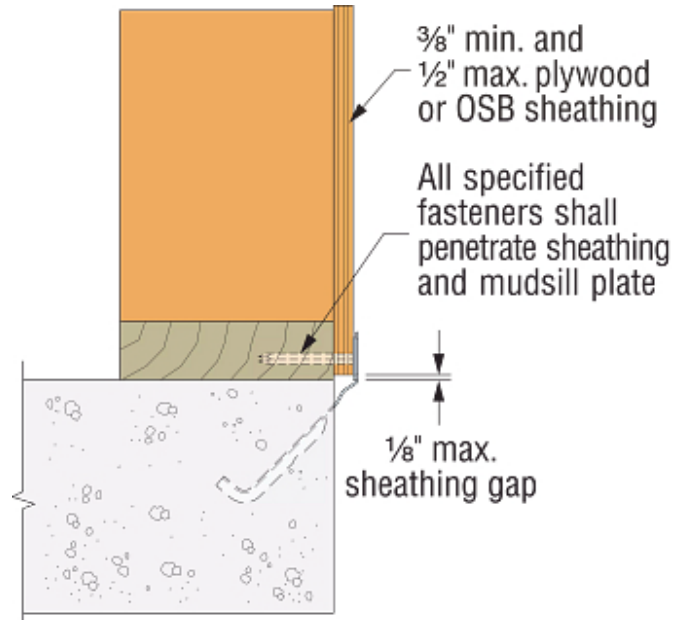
MASOZ/MASOPZ FINAL INSTALLATION WITH OVERHANGING SHEATHING
